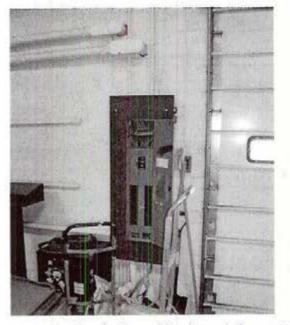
Supply Room #4; obstructed access and exposed wires in breaker panel on East wall.
